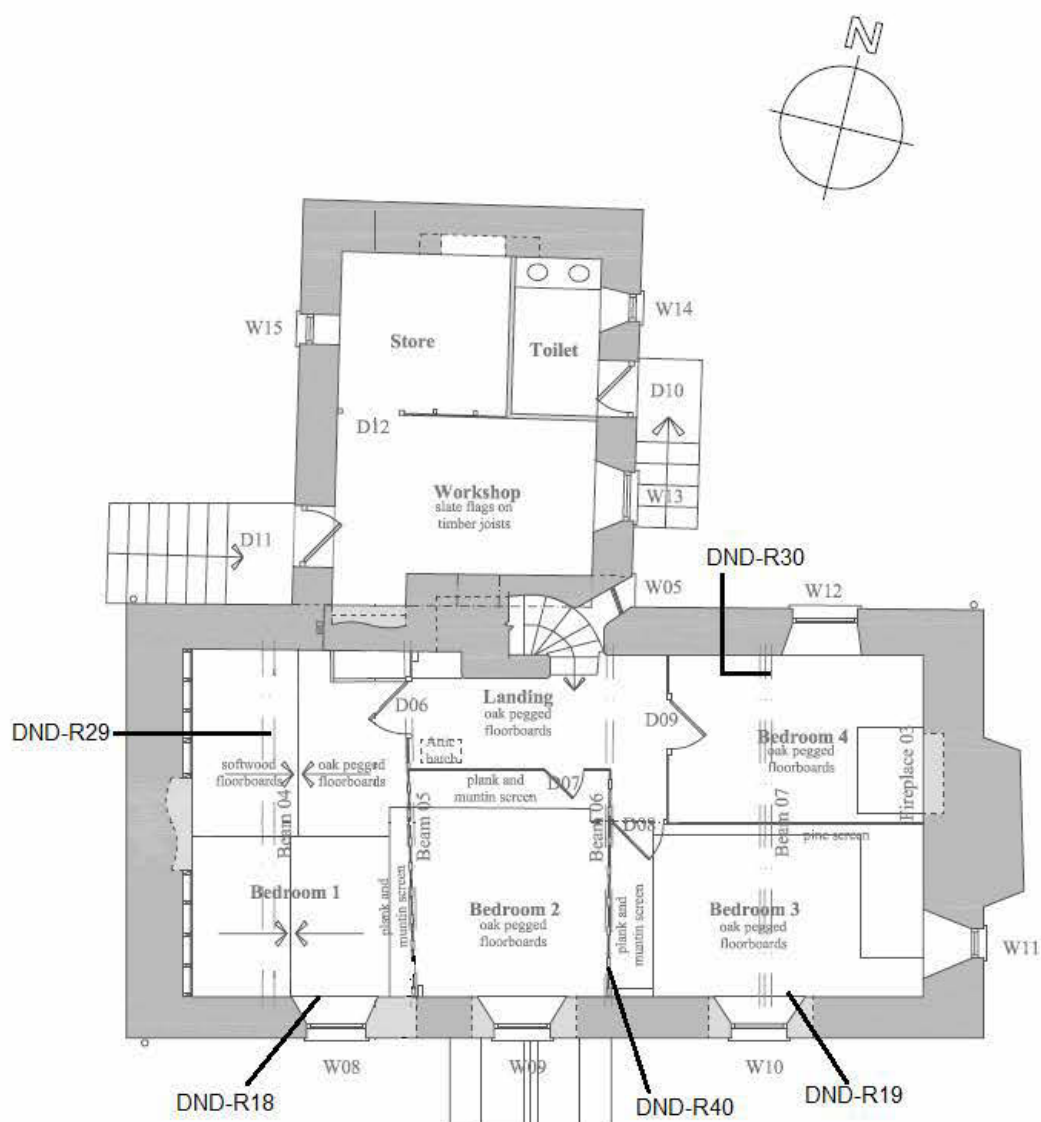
First-floor plan, showing the location of samples DND-R18–19, DND-R29–30, and DND-R40 (Paul Crosby Architect annotated PFR)
